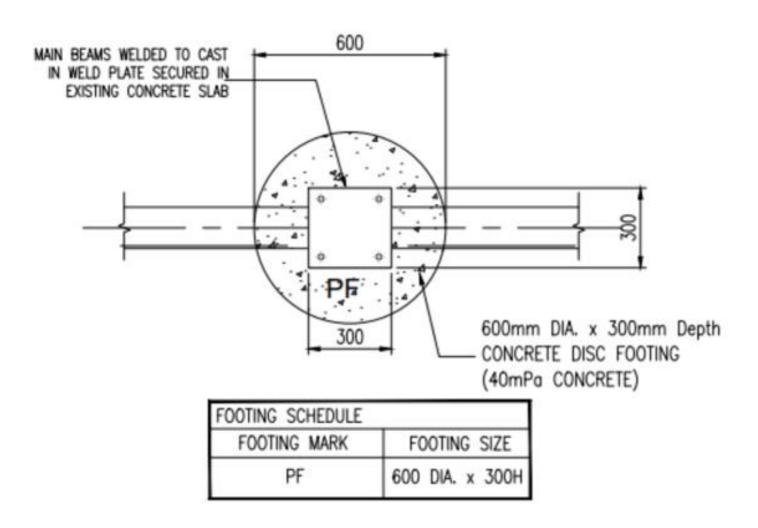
Chlorination building footing (weld plate to concrete disc footing) design drawings.
